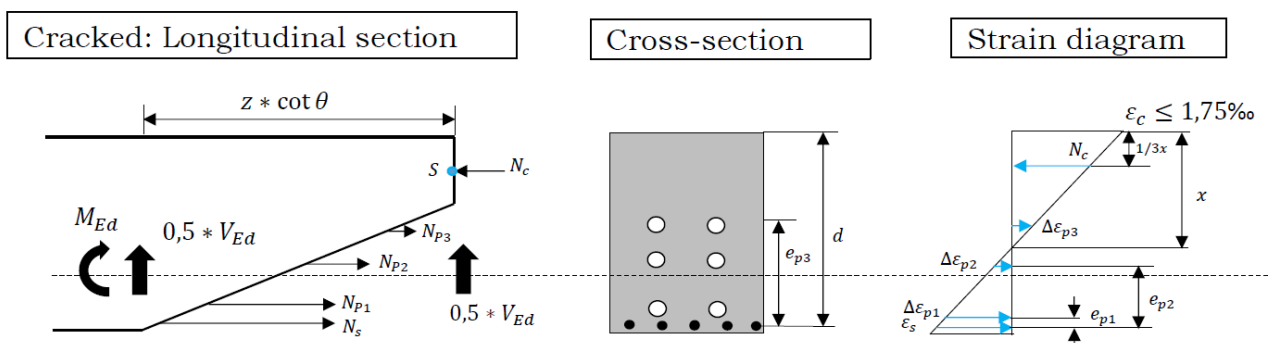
Longitudinal section girder (left), cross-section (middle) and strain diagram (right)
